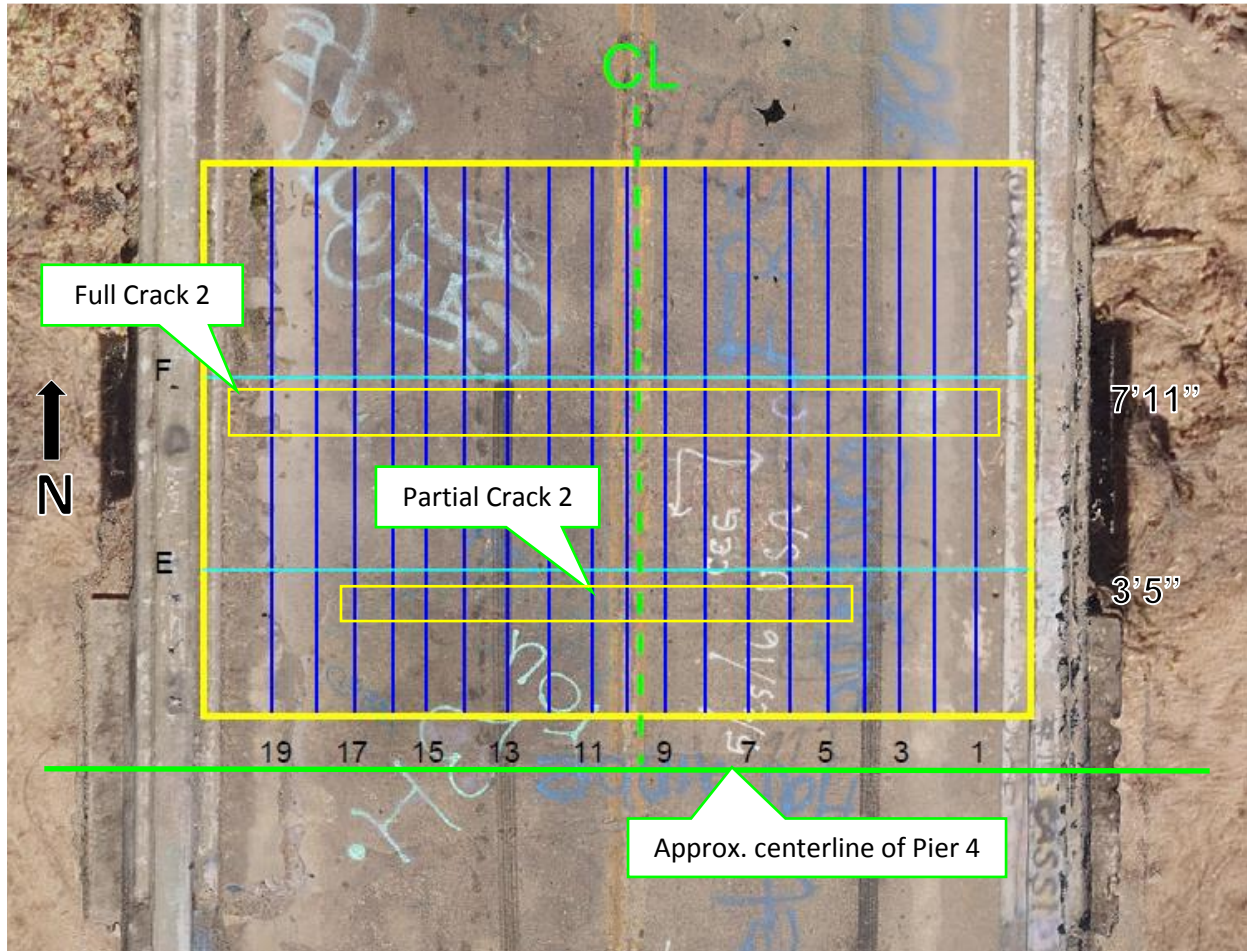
Approximate GPR scan lines at Pier 4/Abutment 5 bridge deck
